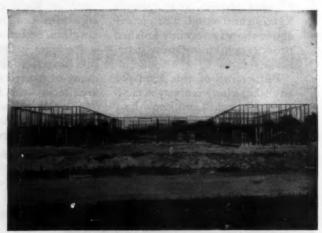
Framework for one of many multiple family apartments built with all-welded steel construction. The Estabrook Homes project is located in Shorewood, Milwaukee, Wisconsin.
